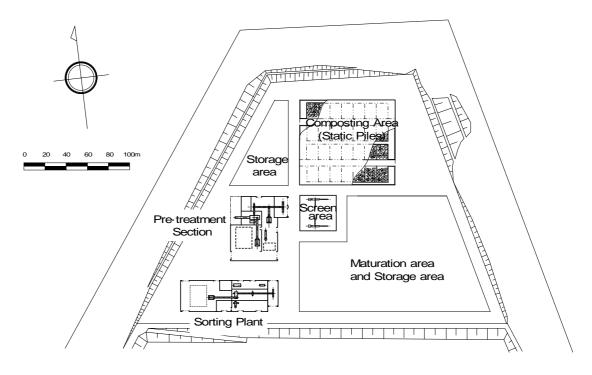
Layout of Proposed Compost Plant in Sofulu
